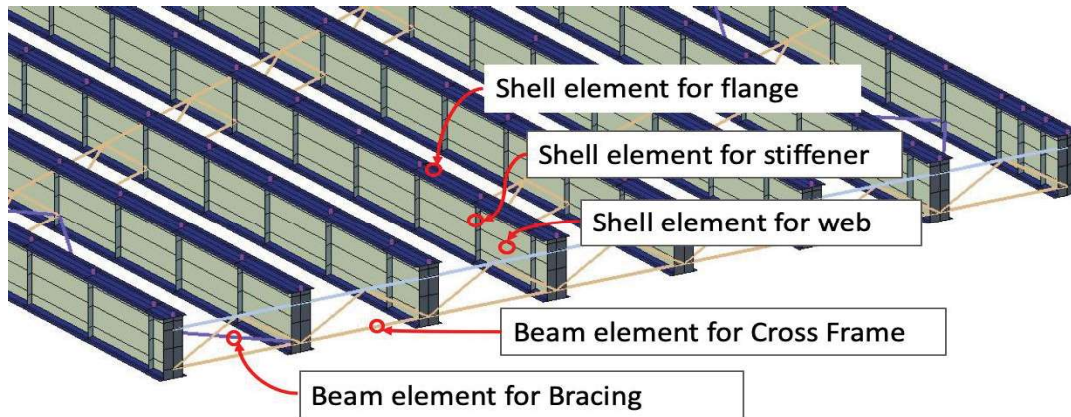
Finite Element Modeling of Girders and Bracing/Cross Frame
